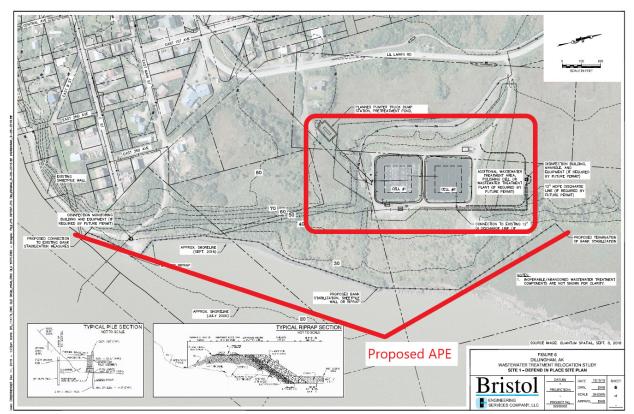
Proposed APE 1 – fortification of existing sewage lagoon cells.
